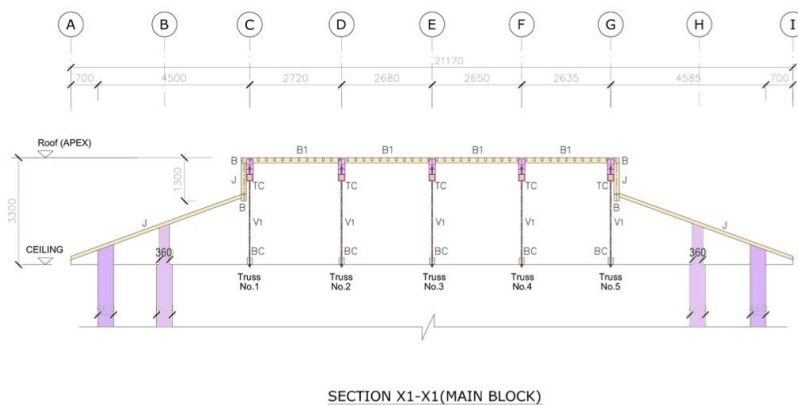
Sections of the roof trusses structure. For location, see the roof measured plan. The load bearing brick walls are coloured in purple. Edited by Hannah Liu.
